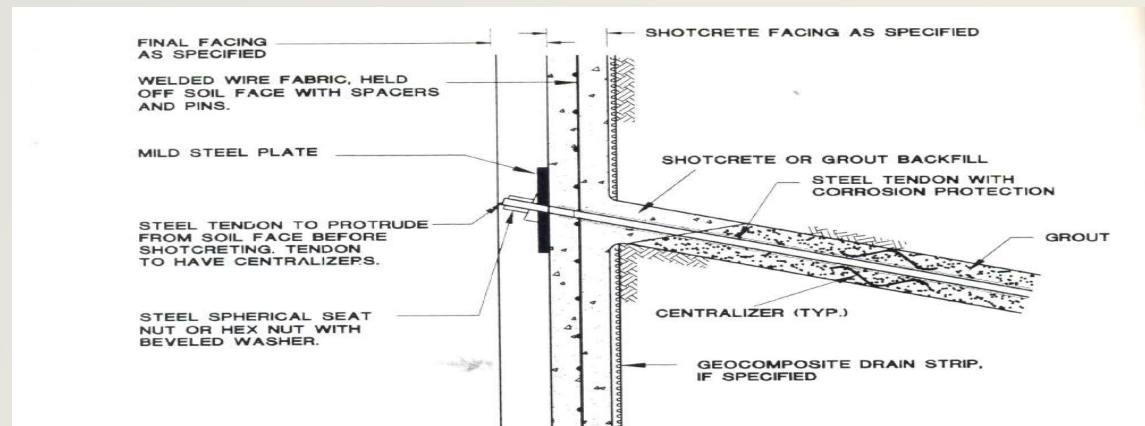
A. Typical Temporary Shotcrete Facing Detail.
